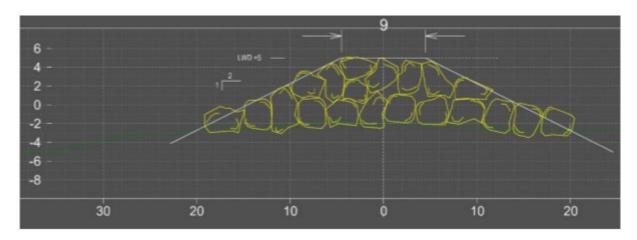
Typical cross-section, East Pier, St. 0+00 - 3+00
